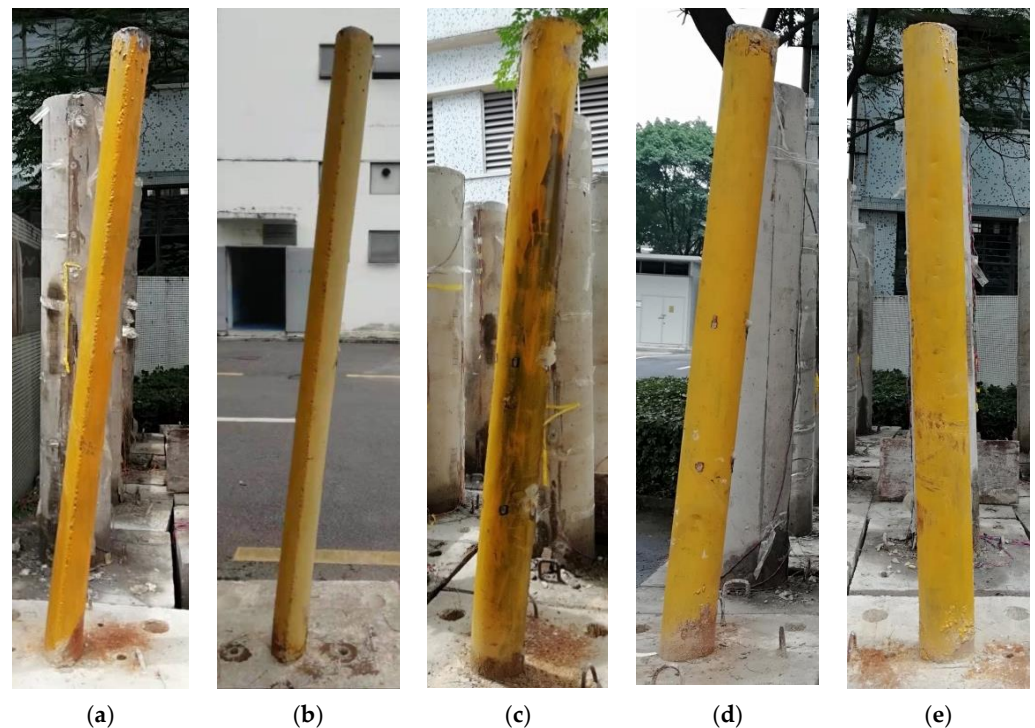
Global failure patterns of the specimens. (a) E-120-I; (b) E-120-U; (c) E-180-I; (d) E-180-U; (e) C-180-I.
